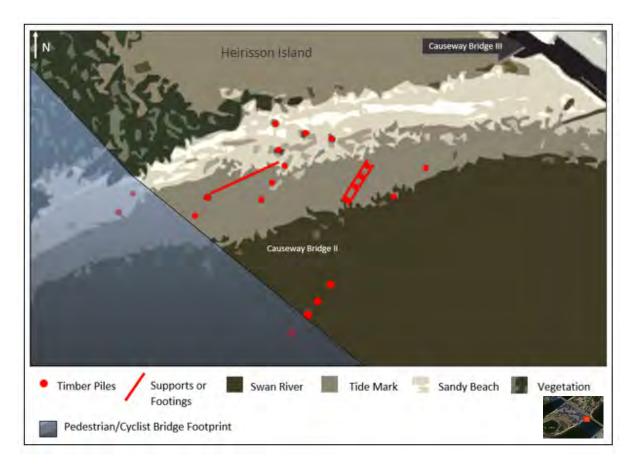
Site plan of remnant timber piles, support beams and footings associated with Causeway Bridge II, immediately west of the existing Causeway Bridge III
